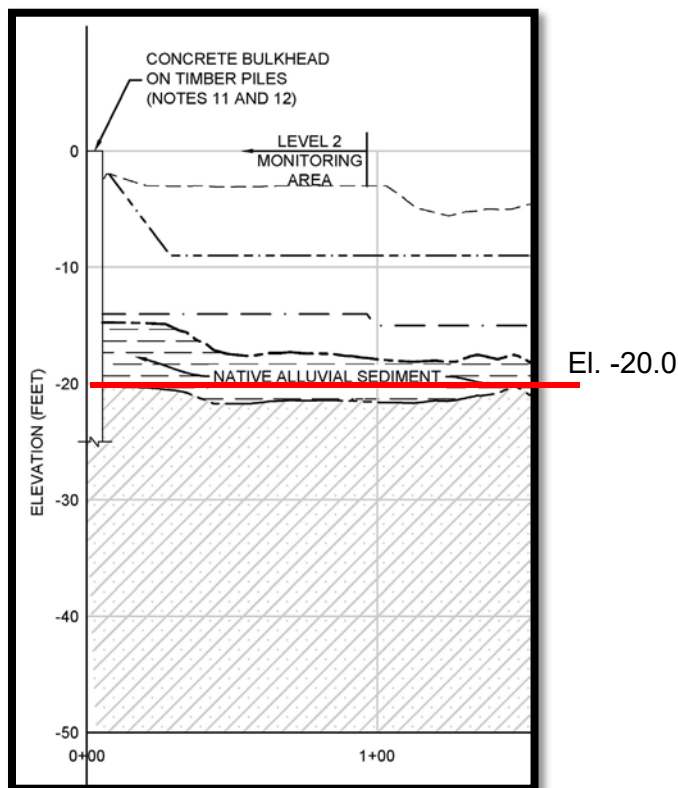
Butler Street Canal Side (Centerline) Profile (See Reference 4 Sheet DR-11)
